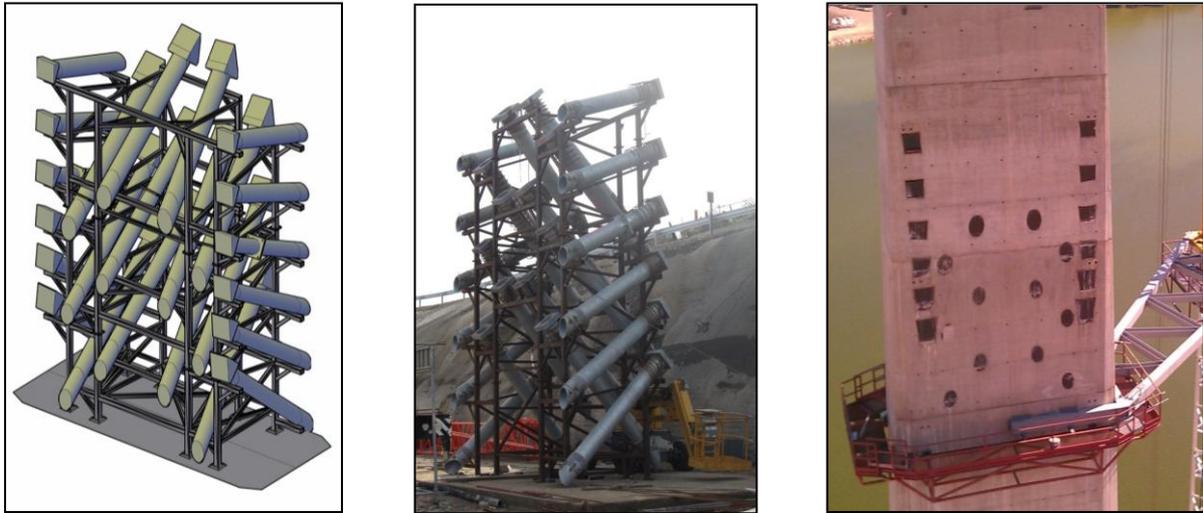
Auxiliary structure for the crossing of stays at the main piers
